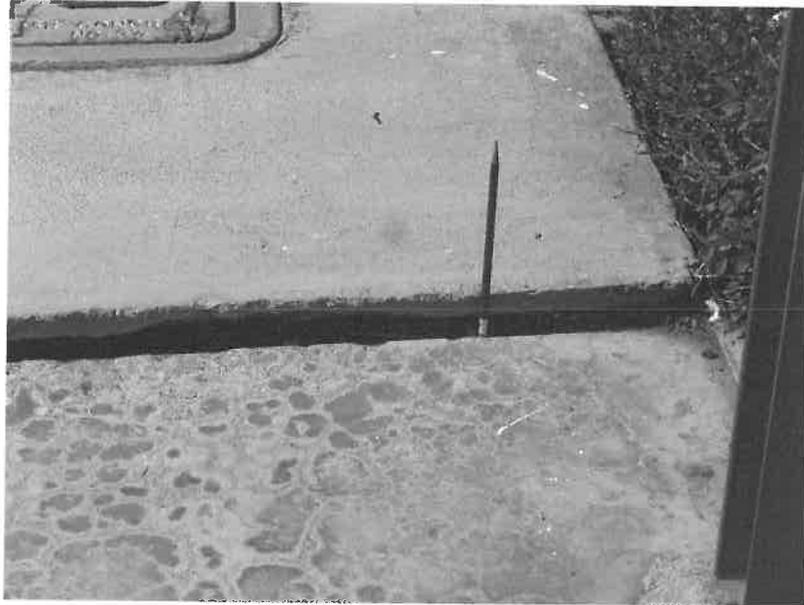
23, Naples, Top Deck Survey: Plaza Park
